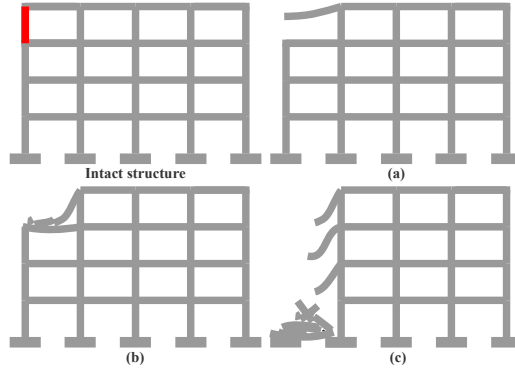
A framed structure subjected to column loss at roof level; (a) failure stops at member level, (b) failure stops at the story level and (c) progressive collapse.
